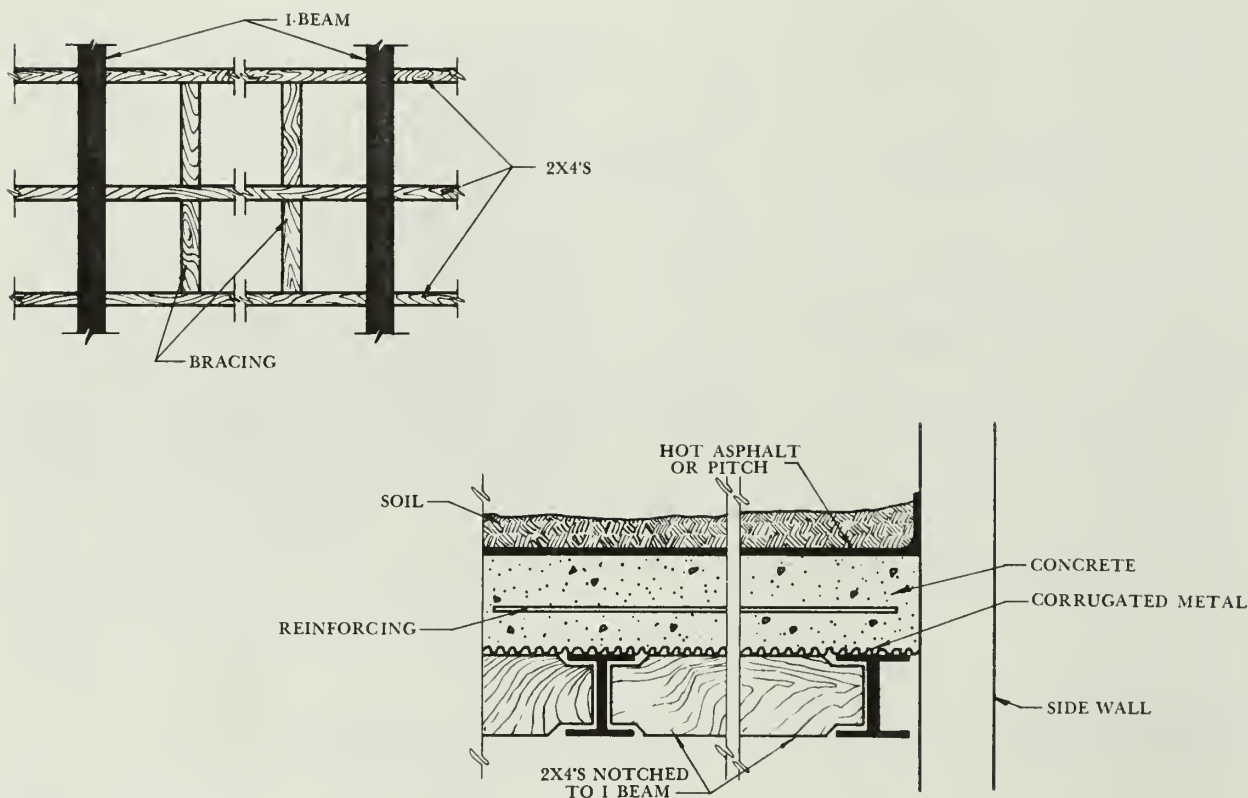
Details of roof supports (in section) at Aztec Ruins National Monument.
